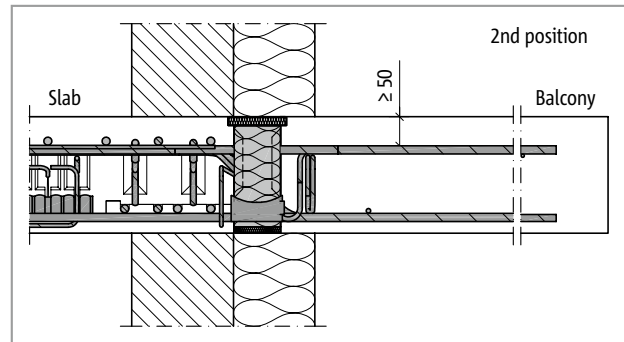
Schöck Isokorb® T type C: Section 2nd position; connection with thermal insulation composite system (TICS)
